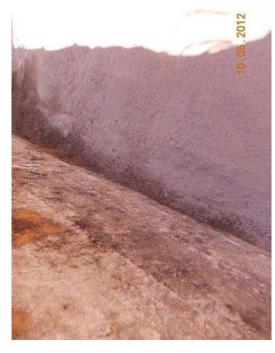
No stain or crack was identified on the walls or base of the concrete box containment.
